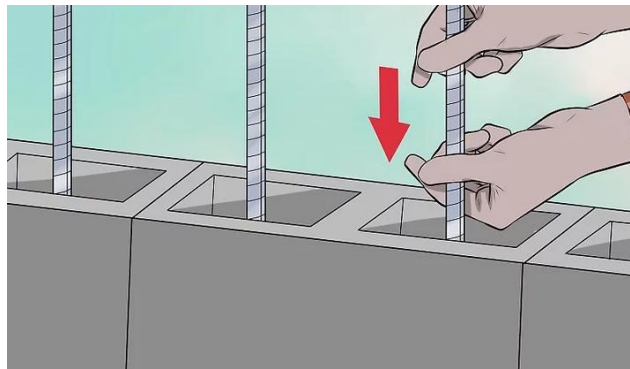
Example of a reinforced concrete "pot block " wall used as the separating bay walls.
